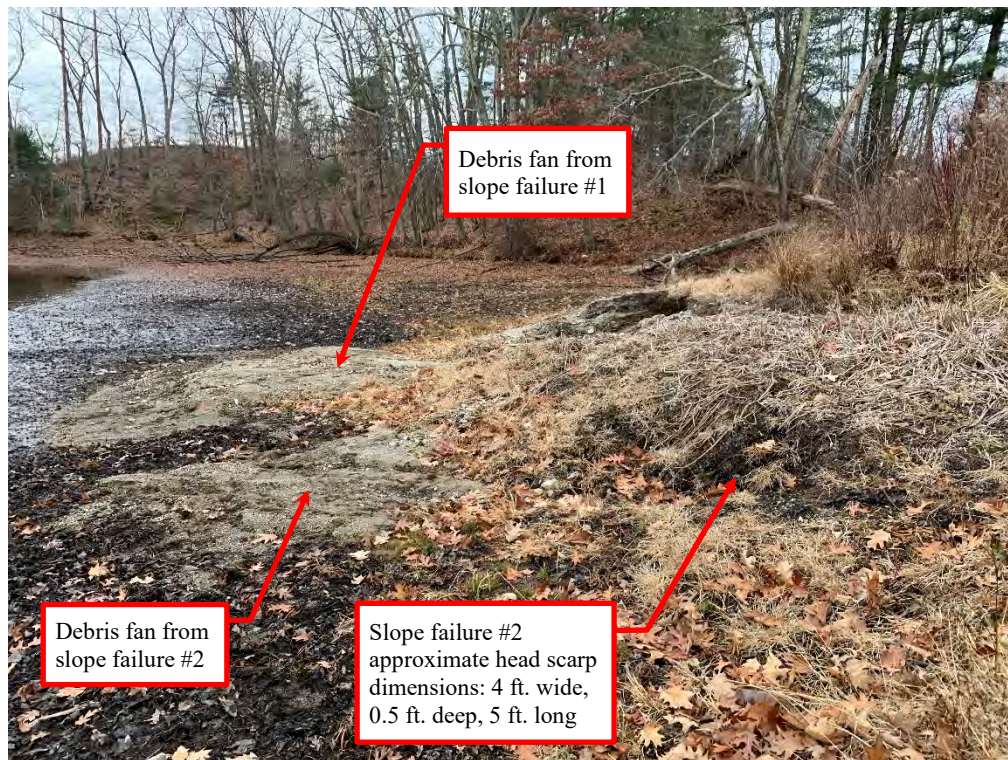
Overview of two slope failures observed on the upstream slope between the spillway and left abutment.
